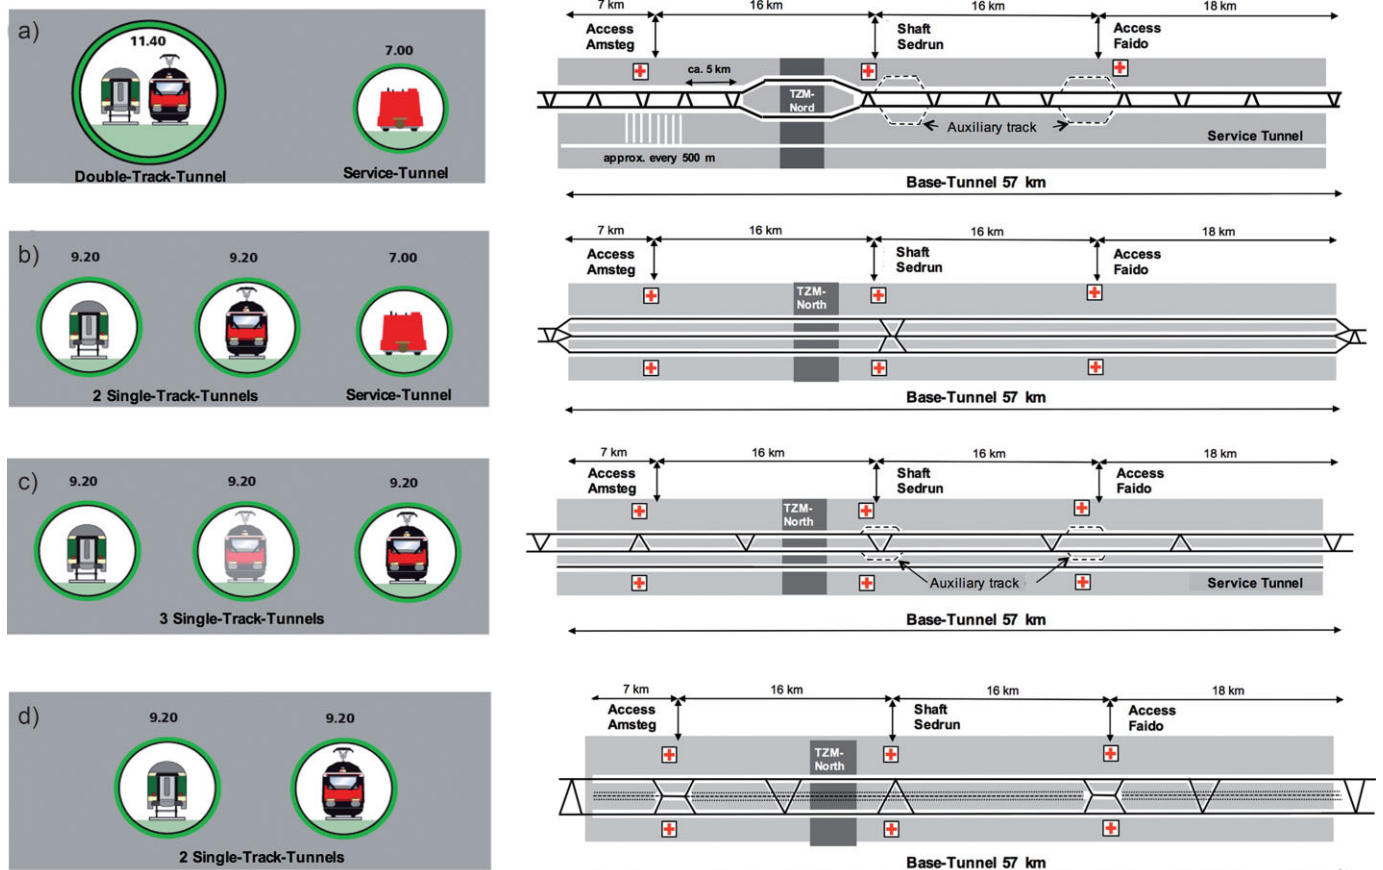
Investigated system variants through the example of the Gotthard Base Tunnel [1]: a) twin-track tunnel (DST) with service tunnel (DT), b) Tunnel system with two single-track tunnels (EST) and a service tunnel, c) three single-track tunnels, d) two single-track tunnels with emergency stations but no service tunnel
